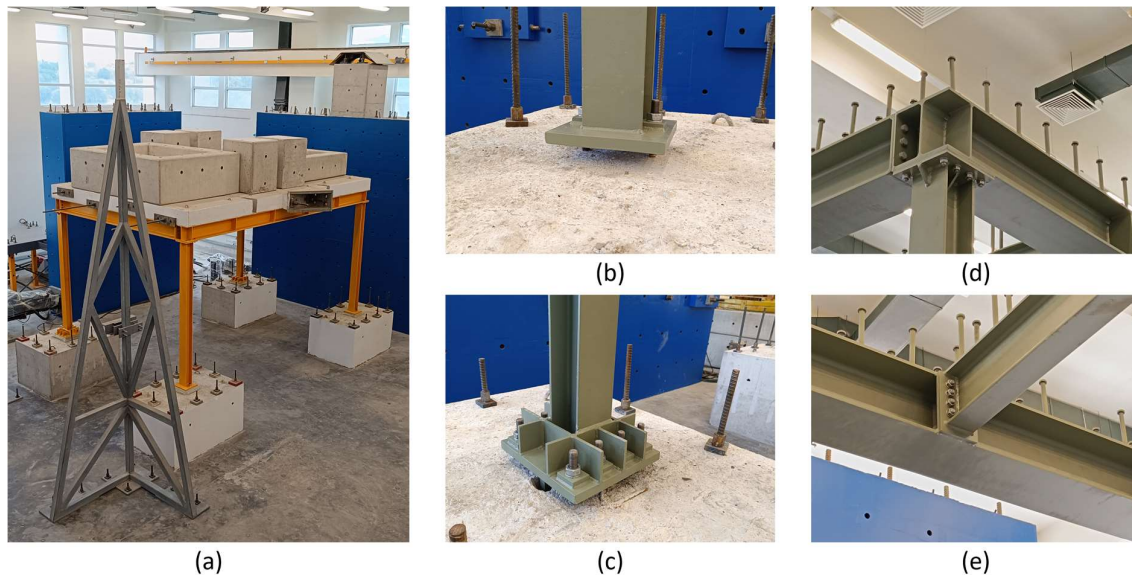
Construction details of the specimen: (a) overview of the mock-up; (b) unstiffened base connection; (c) stiffened base connection; (d) beam-to-column connection; (e) beam-to-beam connection.
